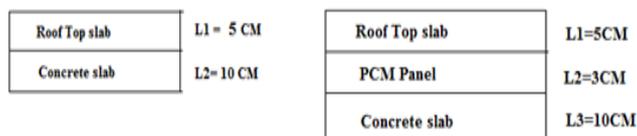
Cross sectional view of the roof (a) without PCM panel (b) with PCM panel
